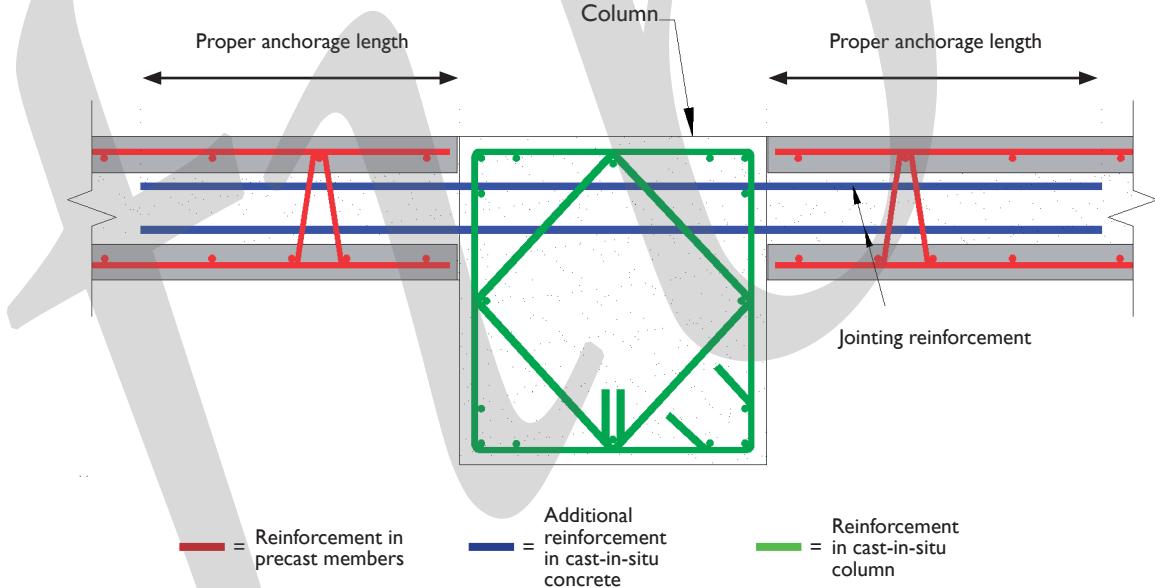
Horizontal section of connection of cast-in-situ column with double walls
